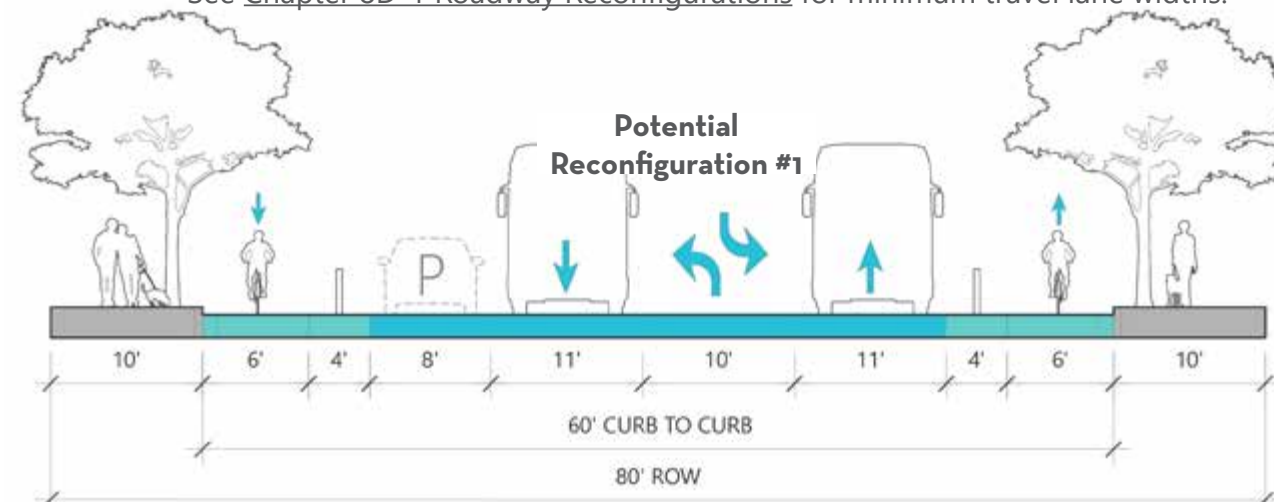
Potential Reconfiguration #1: One-Way, In-Street, Class IV Bikeway on a Downtown Collector Street.
